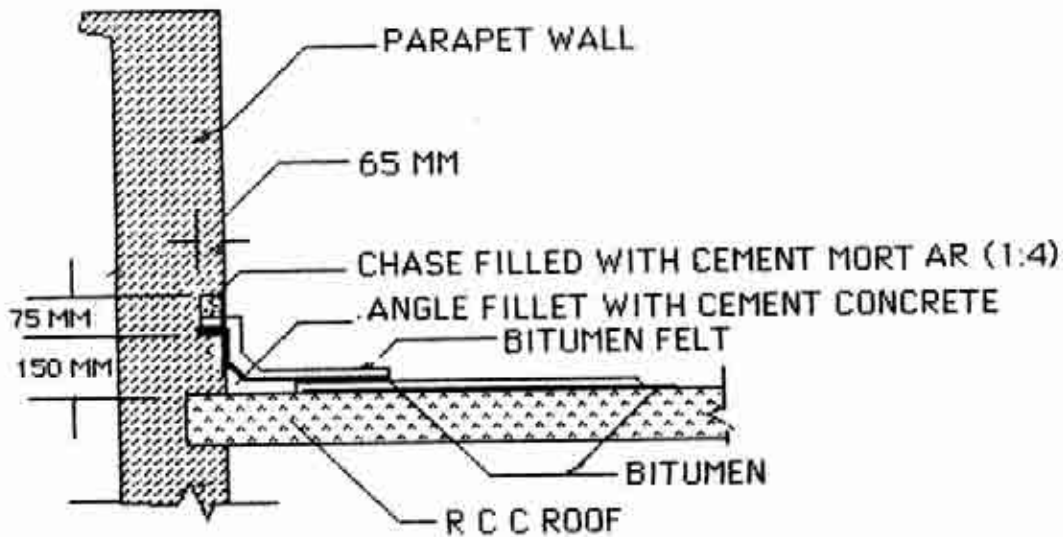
A PARAPET WALL OVER 450MM IN HEIGHT
